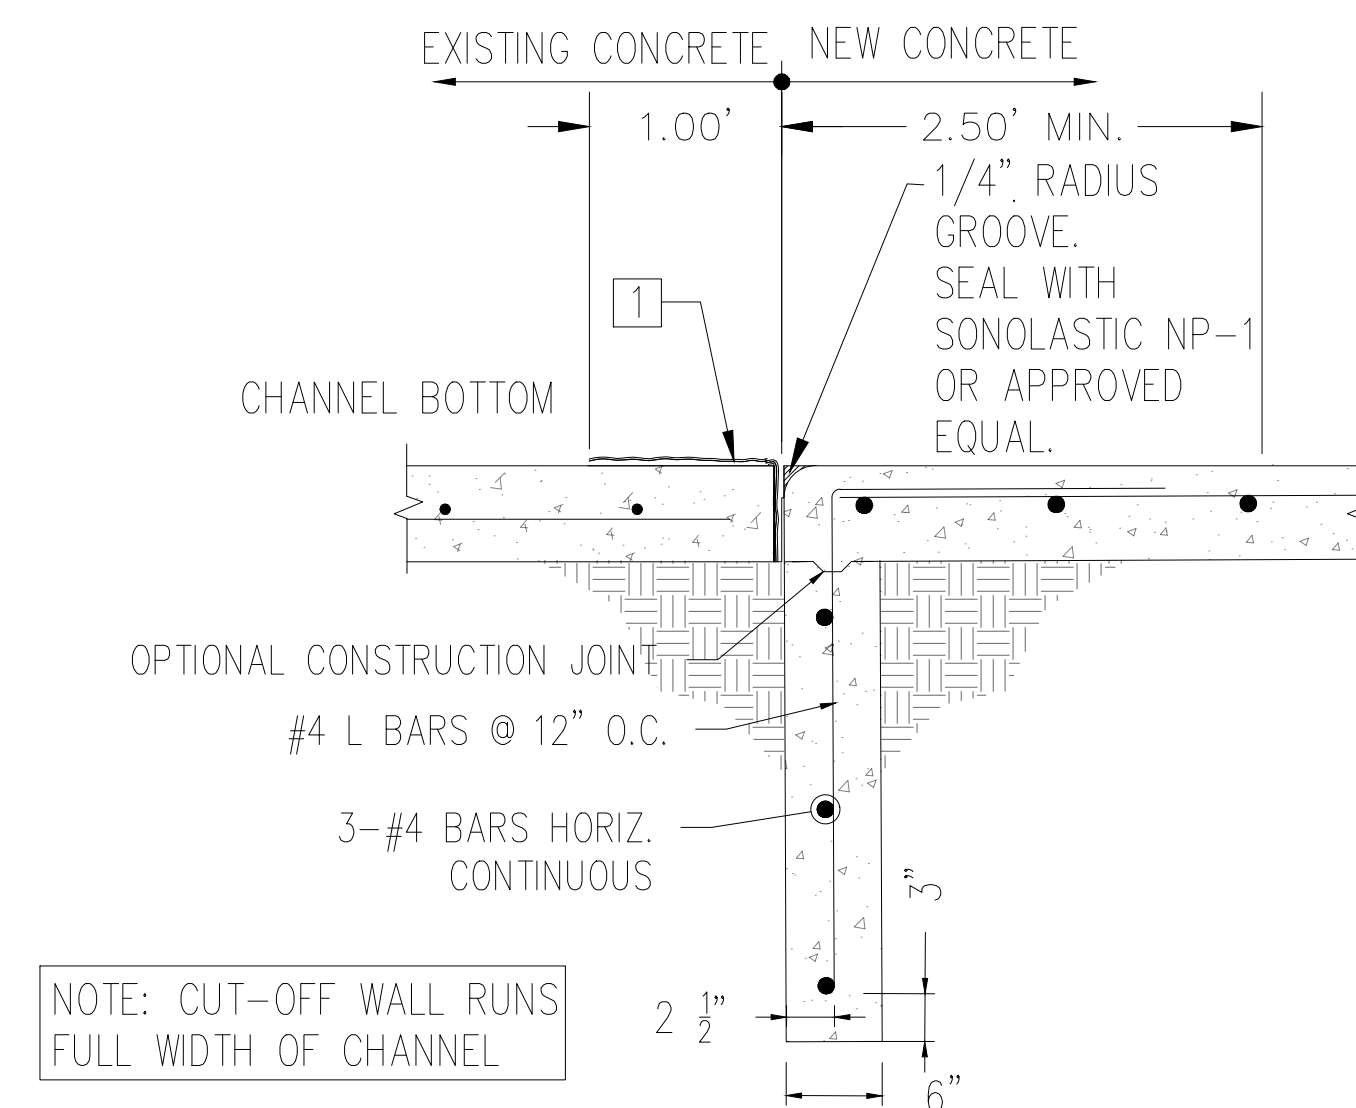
DETAIL D: TYPICAL TRANSVERSE CONSTRUCTION JOINT
